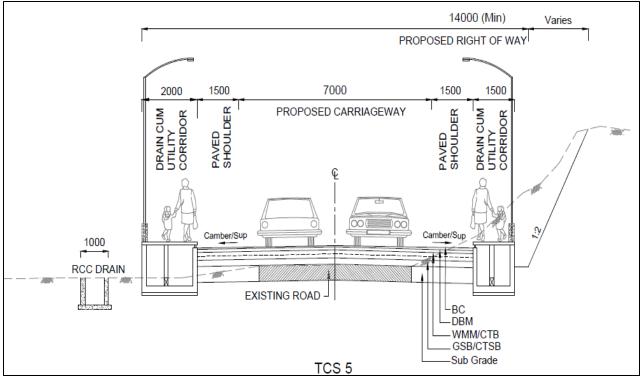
TCS-5: Typical Cross Section for 2 Lane with Half Cut in Existing (Urban Section)
